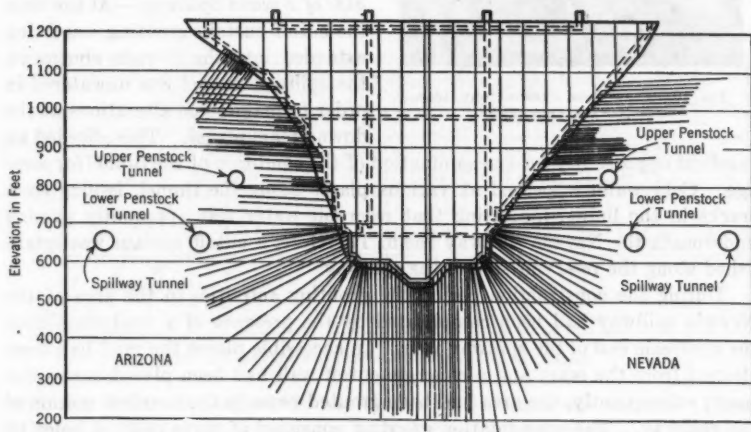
PROFILE OF DAM SITE SHOWING ADDITIONAL GROUT CURTAIN
